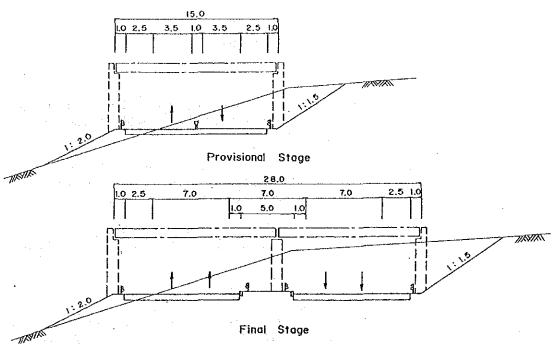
Typical Cross Sections on Staged Construction
